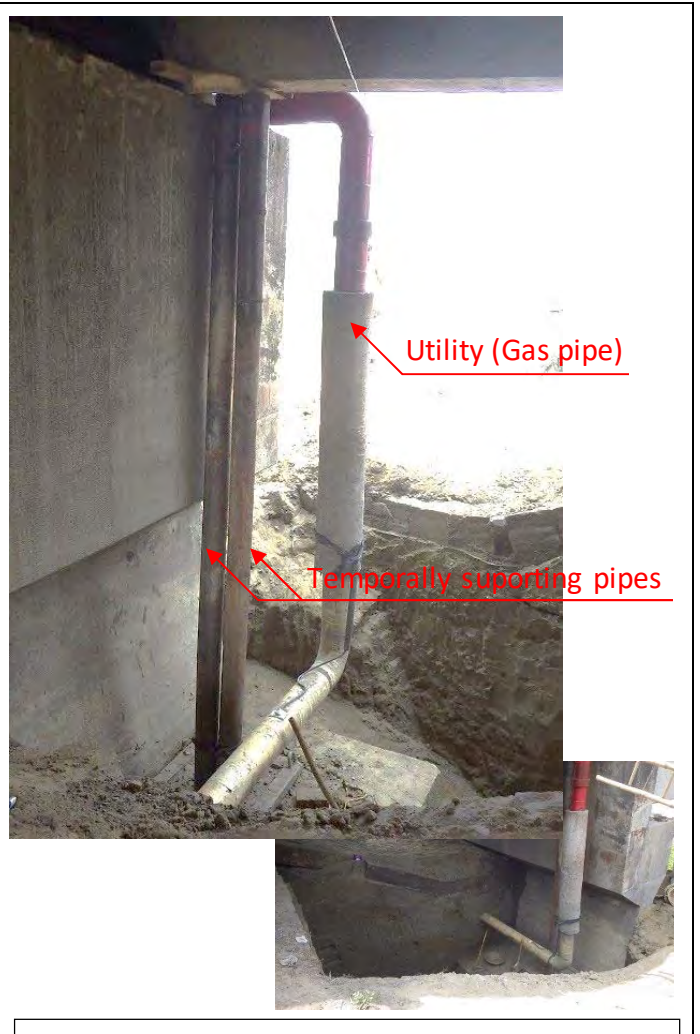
Temporary Support on the damaged Girder & excavation to build brick support (P1, Dhaka side)
